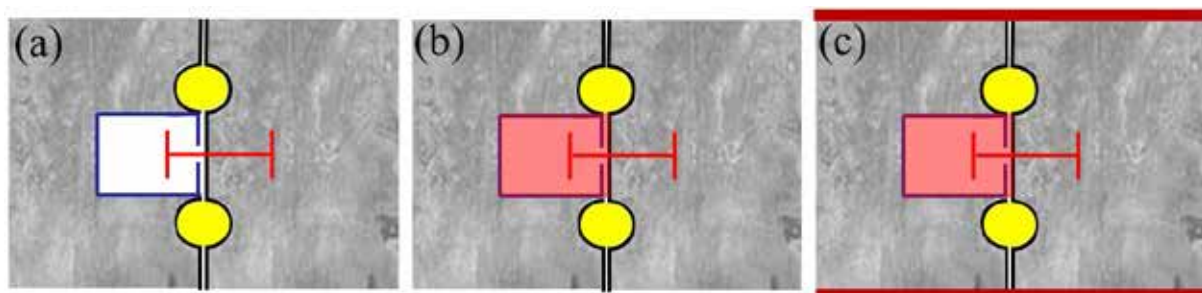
Lateral connection of a male side wall with I-beam and a female side wall with tube by in-situ grouting
